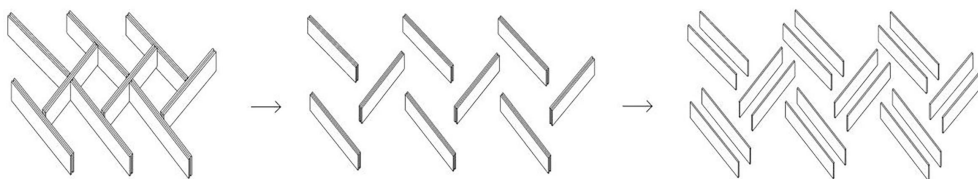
Use the straight beam and vertical hollow double beam to fit gridshell surface
